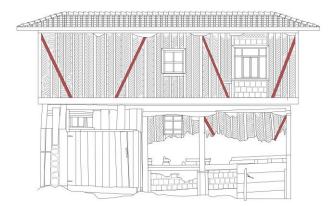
Wooden frame facade drawing and brace placement of house number 57
